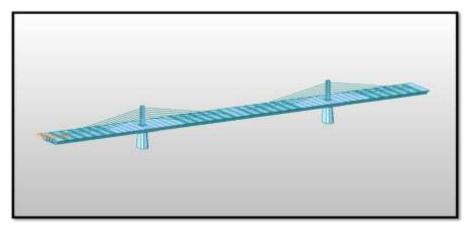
Iso view of the model showing different elements (cable, girder, pylon and pier)
